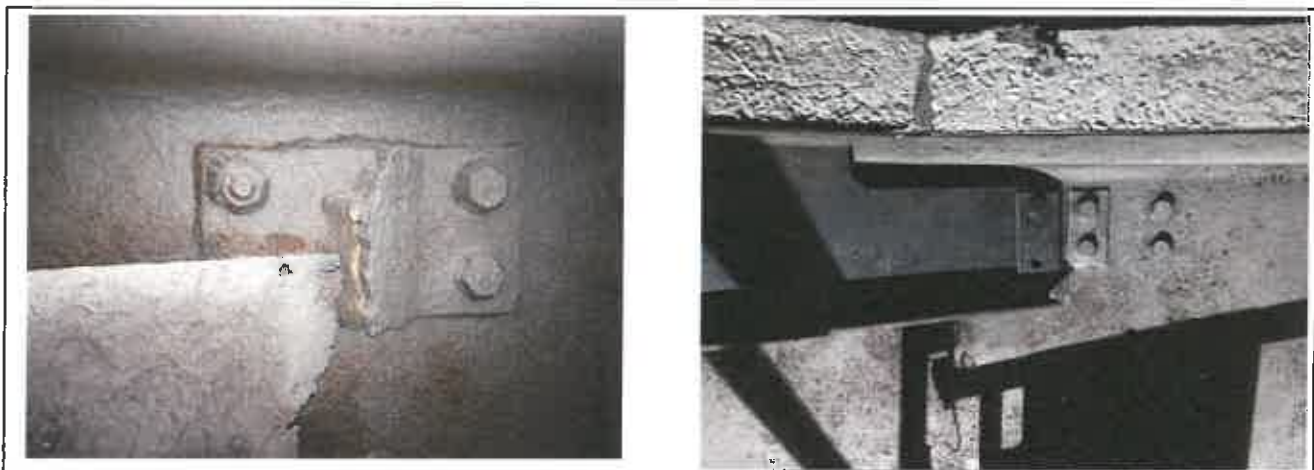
Secondary framing connection with 100% section loss before repair [left] and replacement connection [right]
